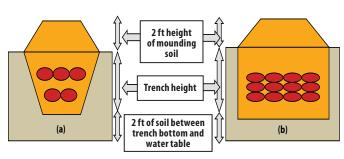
Layout of trapezoidal (a) and rectangular trench (b) for burying carcasses.
